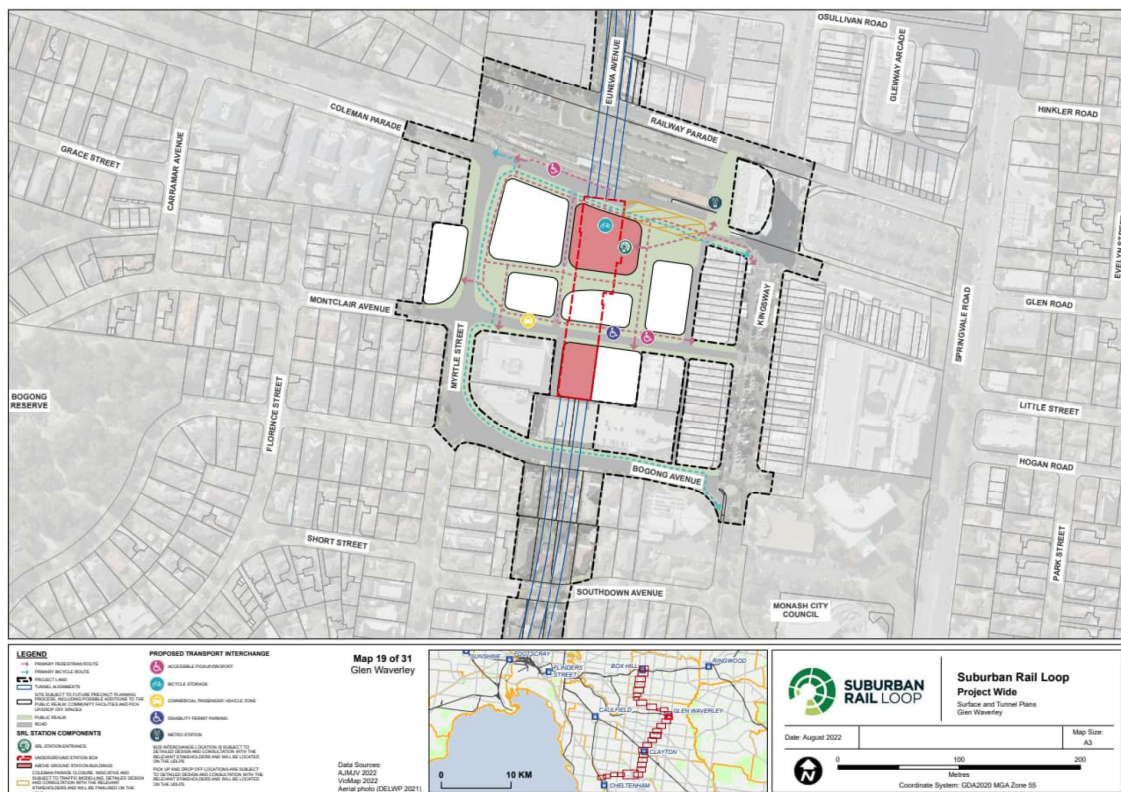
GLEN WAVERLEY SURFACE AND TUNNEL PLAN
